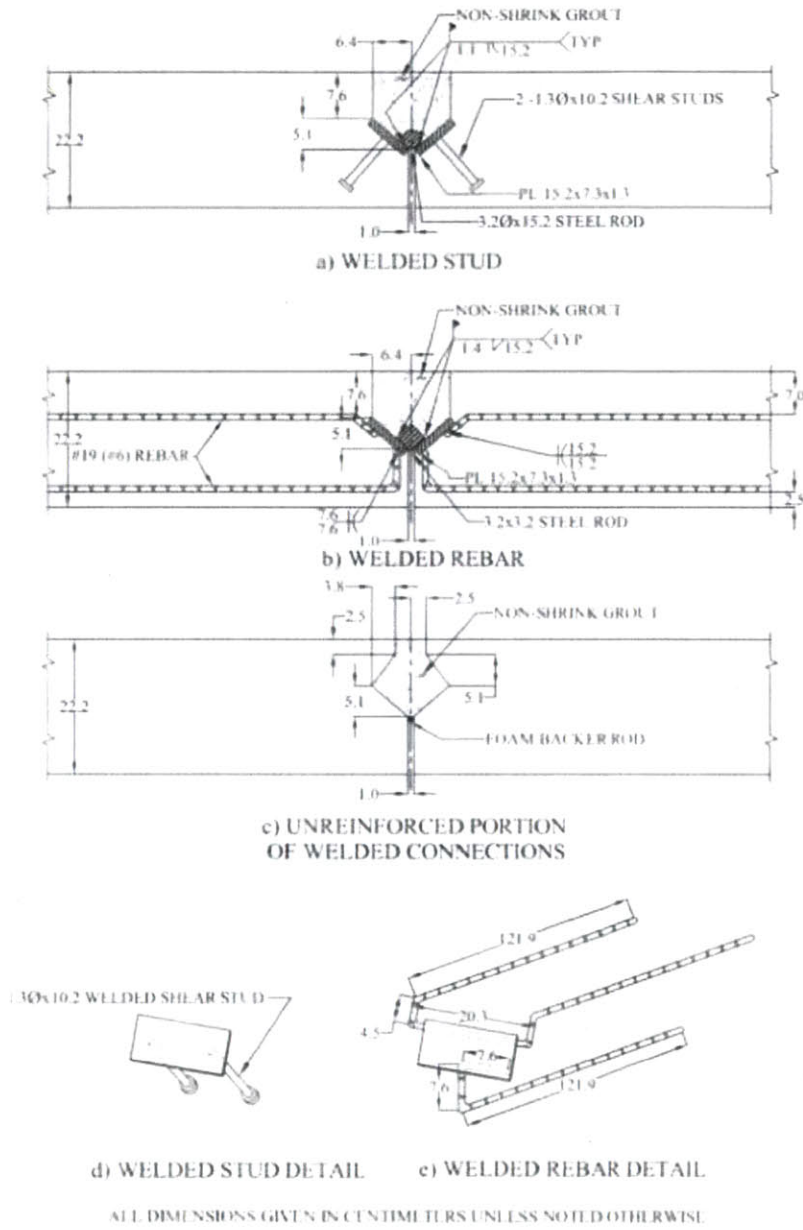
Conventional Connections studied by Porter (Porter 2010)
